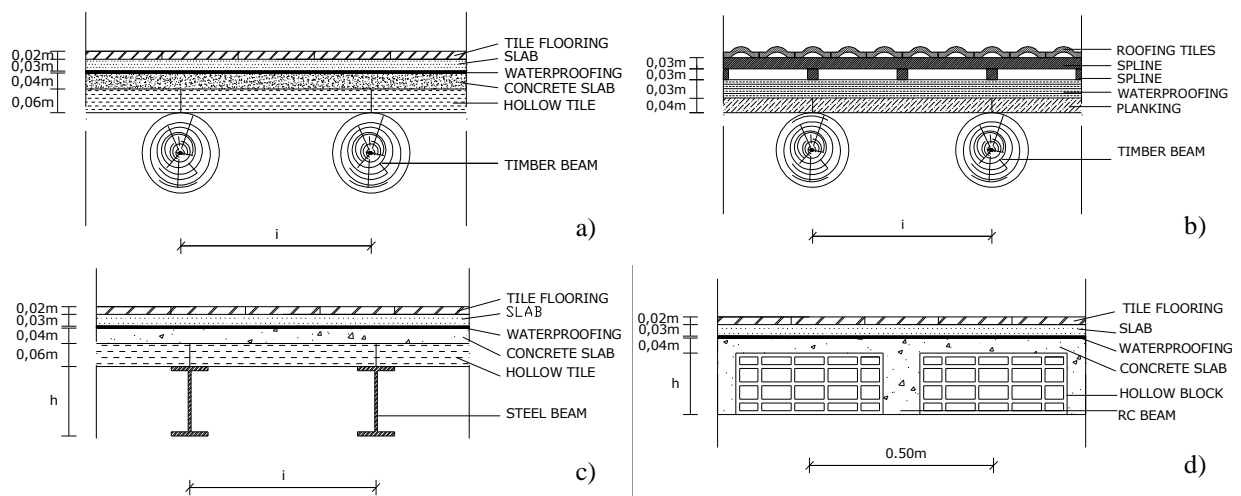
Main Vesuvian roof types: a) not ventilated timber; b) ventilated timber; c) steel; d) RC
